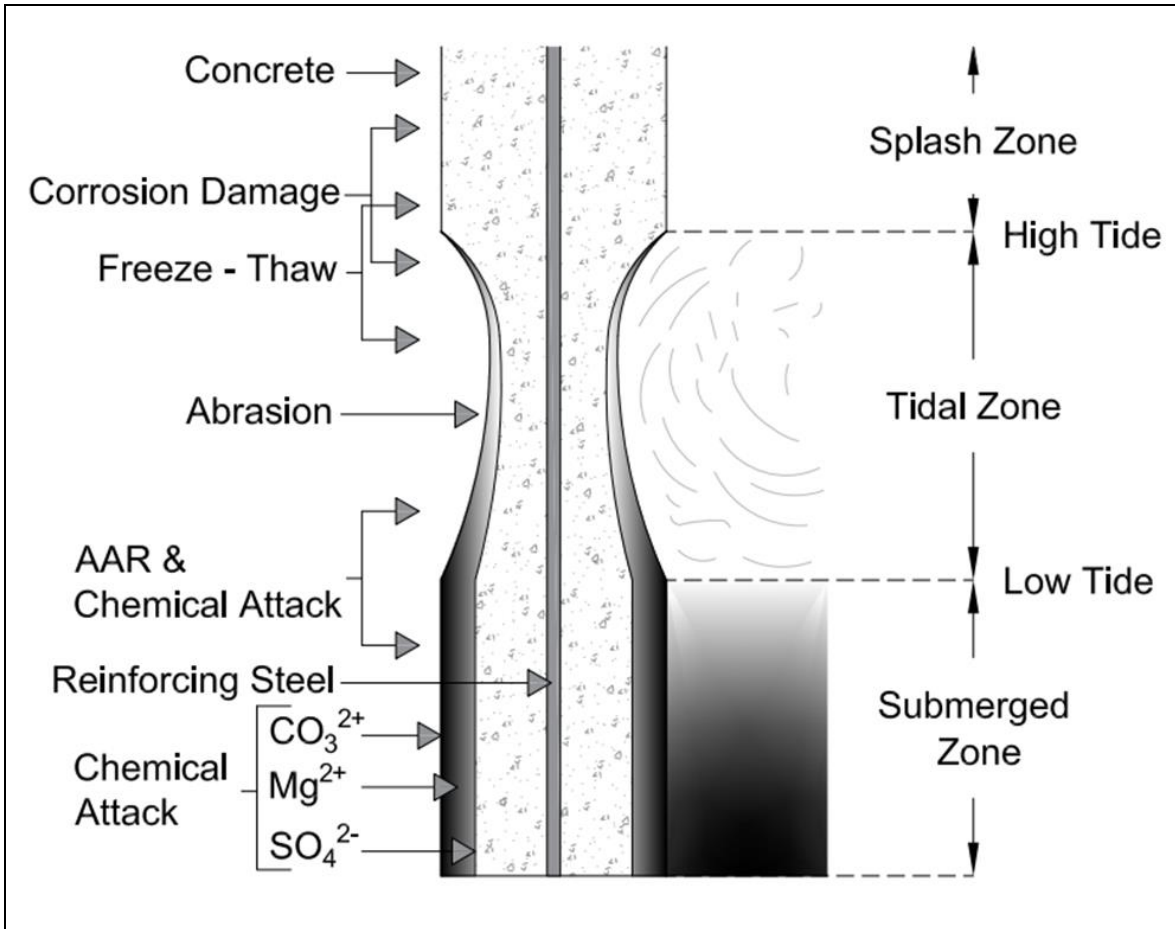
Reinforced concrete pile exposed to different zones in a marine environment [7]
